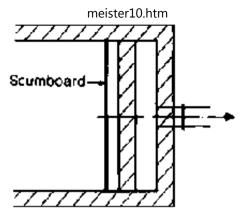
Septic tank outlet using full width weir (Plan)
